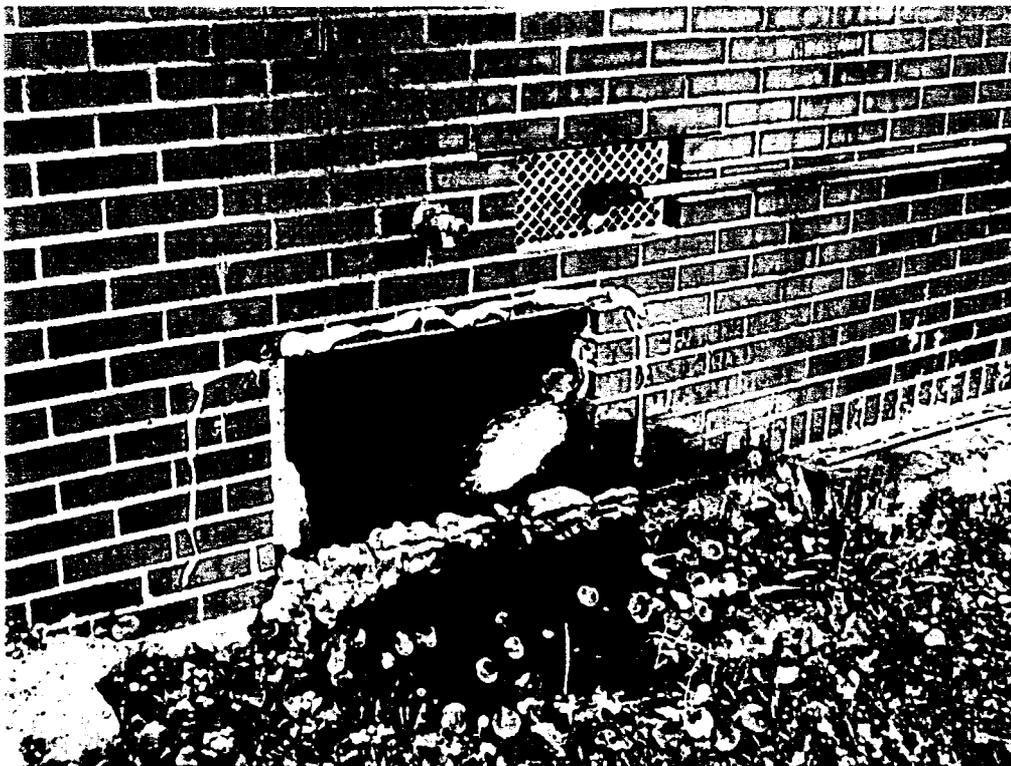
AST NS71's supply and return piping exit the ground and enter building NS-71's crawl space through this access.
